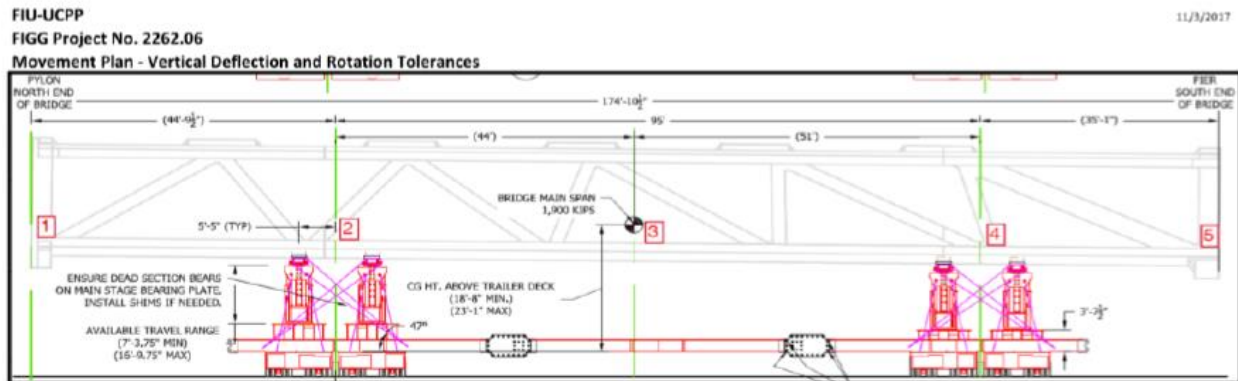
Schematic of movement plan from SPMT Bridge Movement Monitoring Plan
